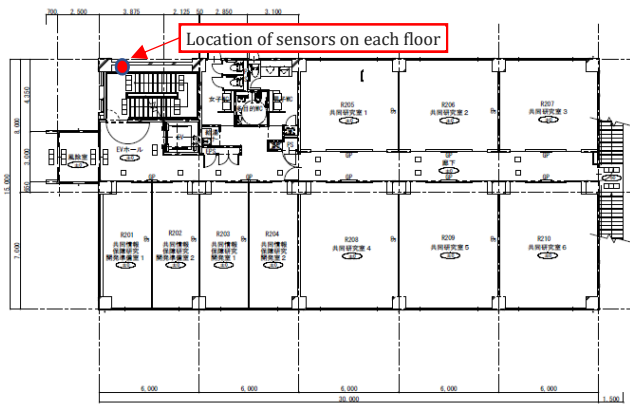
Plan view of 2nd floor of the building and locations of practical device installed.
